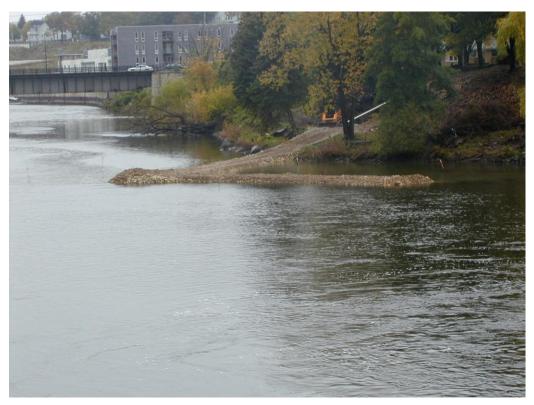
Looking southwest toward haul road and initial leg of temporary causeway.
